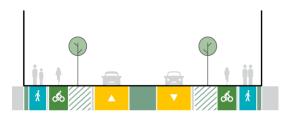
CFAF Outcome - Upgrade to Wainui Road indicative 24 m cross section
